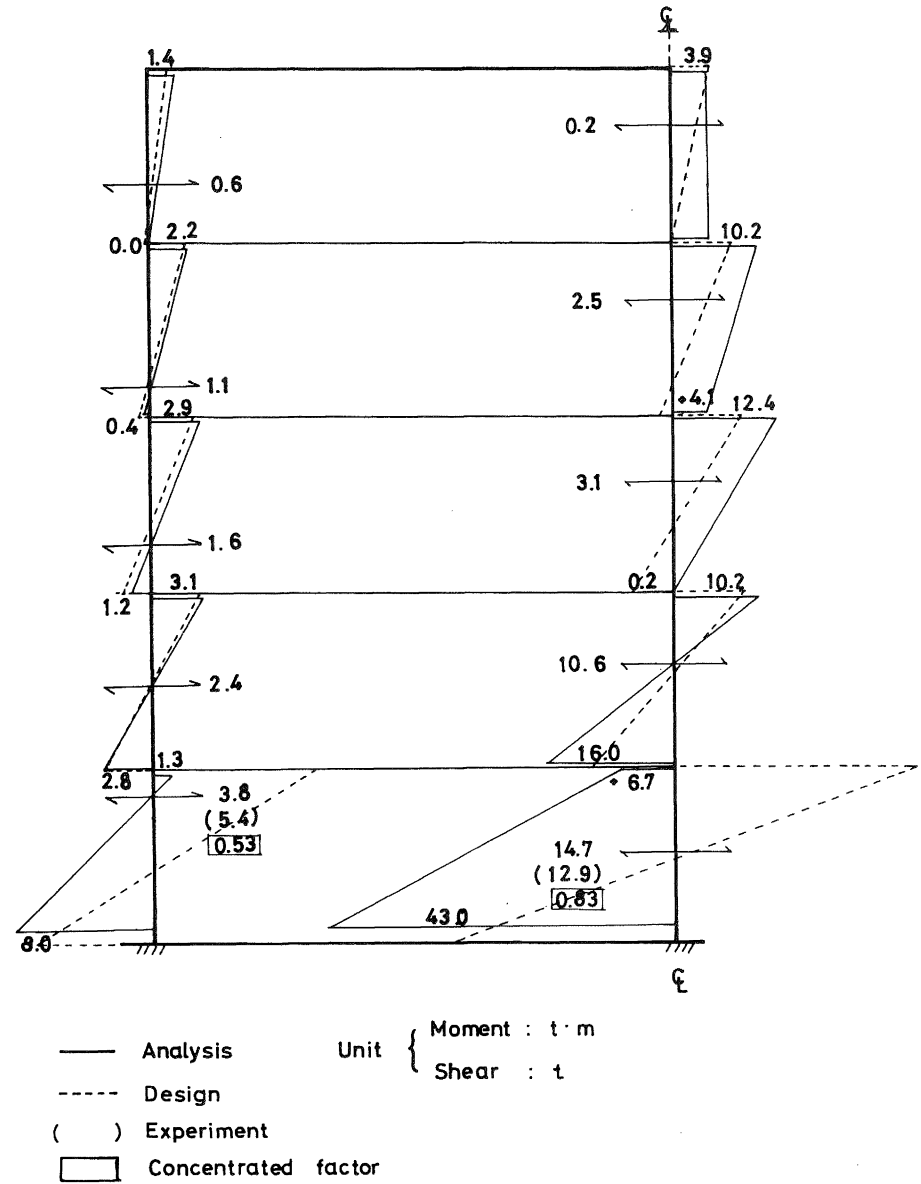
Stress distribution in walled columns of B frame (At load scale 1)
